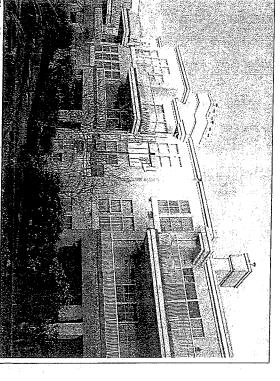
Partial overview of 6<sup>th</sup> Ave., South elevation. Note work in progress at balconies (units 208 and 212) and unit 210/310 walls.
